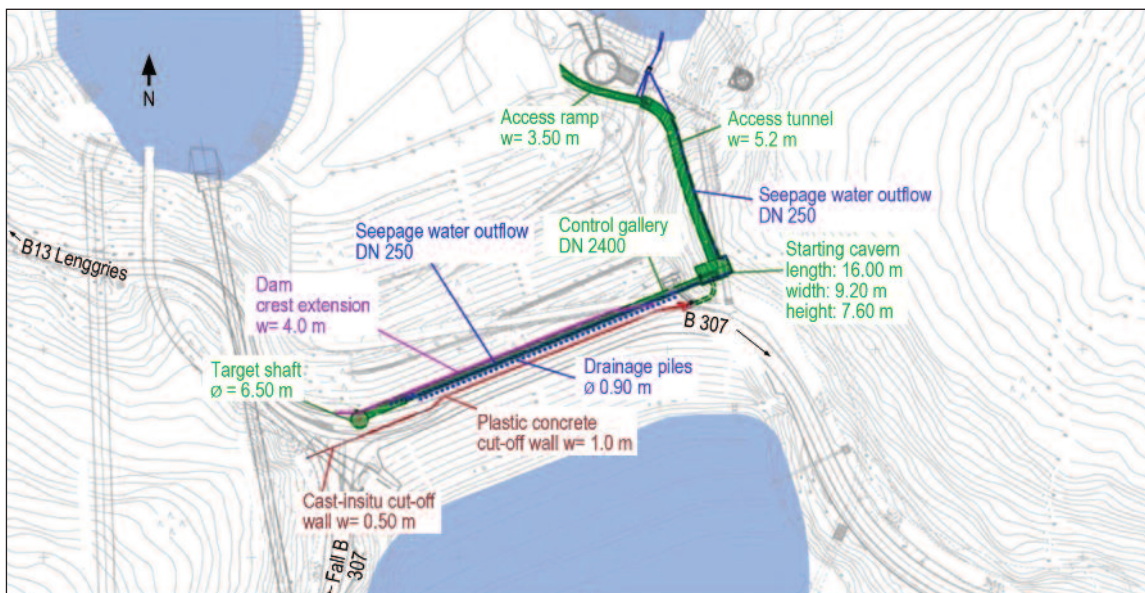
Site map of retrofitting measures (cut-off wall, control gallery and drainage piles).
